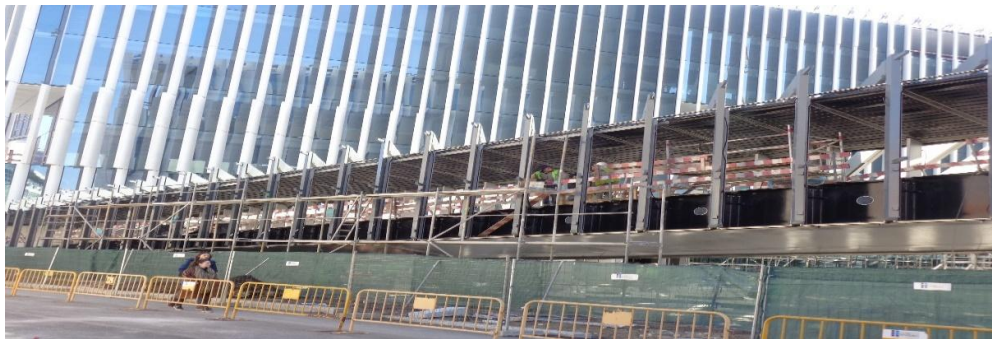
North Footbridge of EDP's Building, Cais do Sodre, Lisbon
